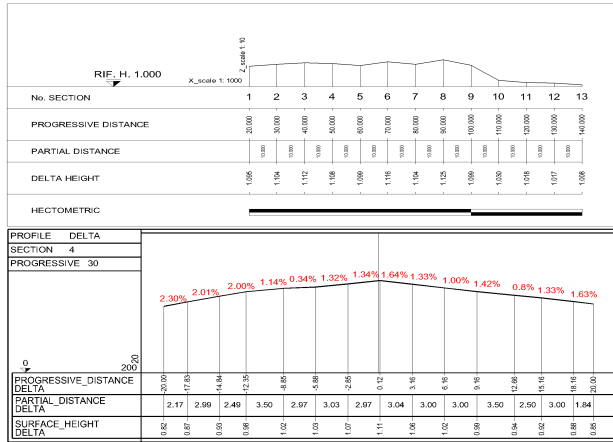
Transverse, Longitudinal and Digital Elevation Model of a 200m Taxiway Section
